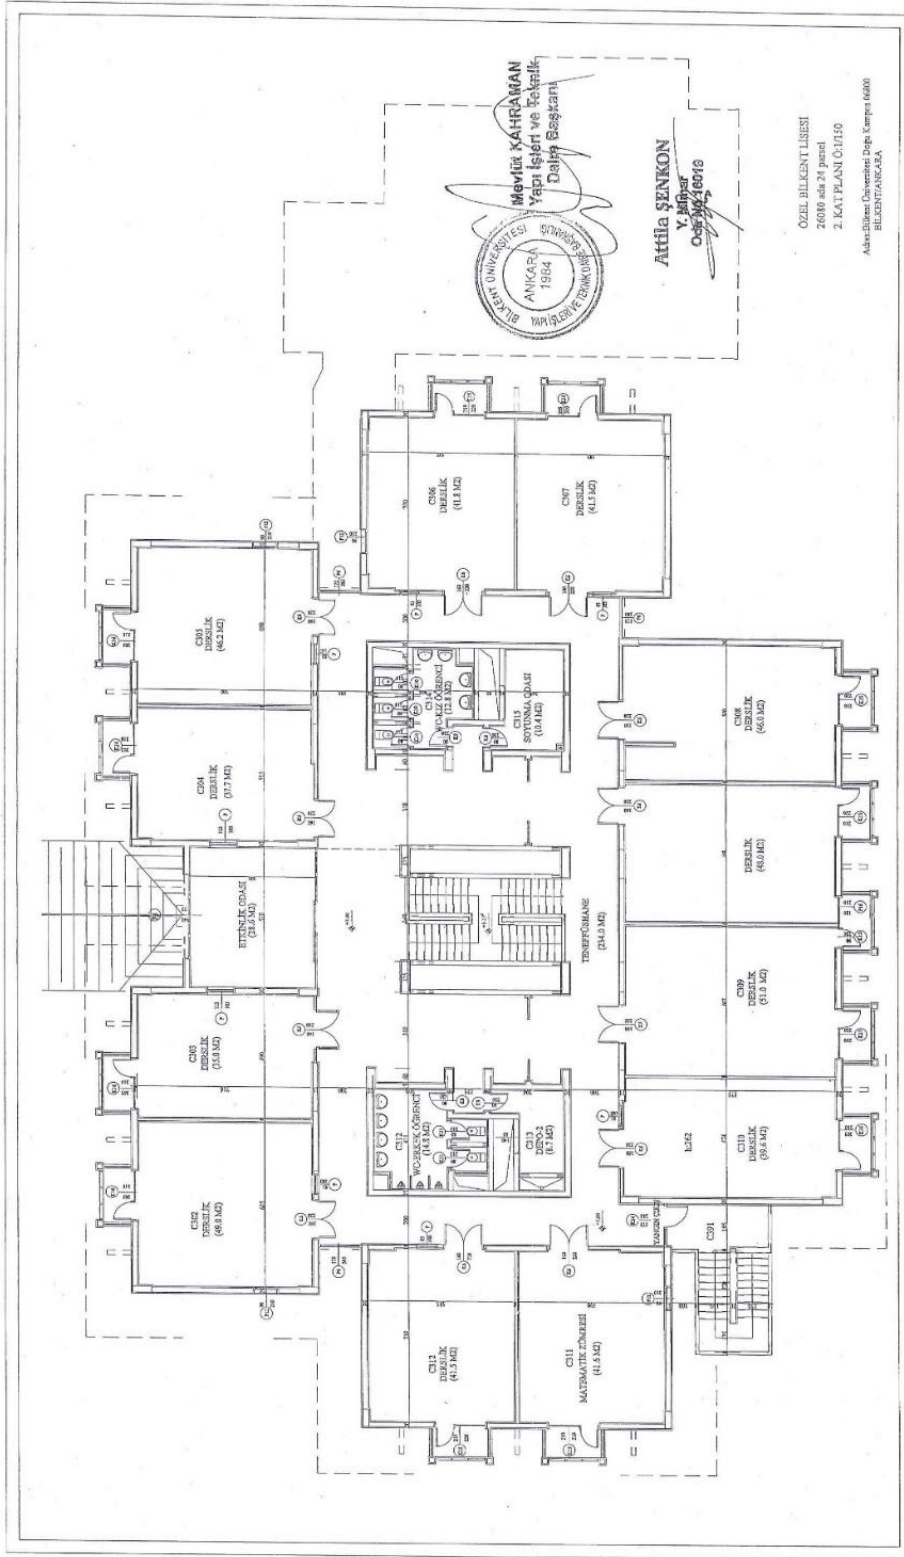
Second floor plan of Bilkent High School (not to scale)
